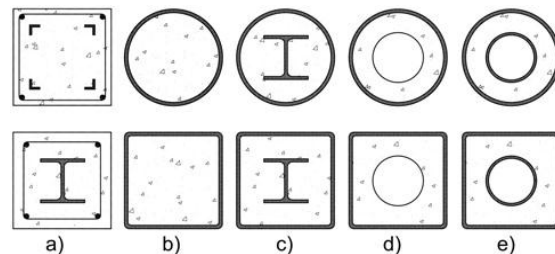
Various types of composite columns: concrete encased steel (CES) (a), CFST (b), combination of CES and
